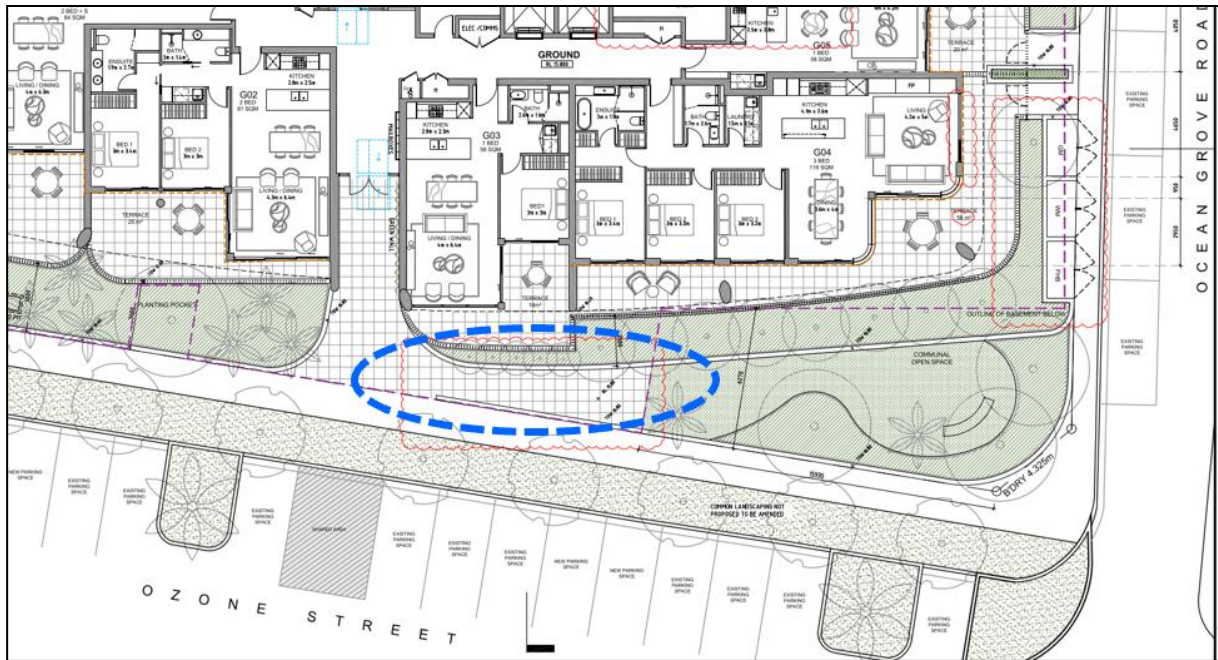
proposed landscape treatment at Unit G03 (source: Applicant's revision 1 plans)
